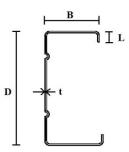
Cross sectional profile of cold-formed steel lipped channel section LC7510
